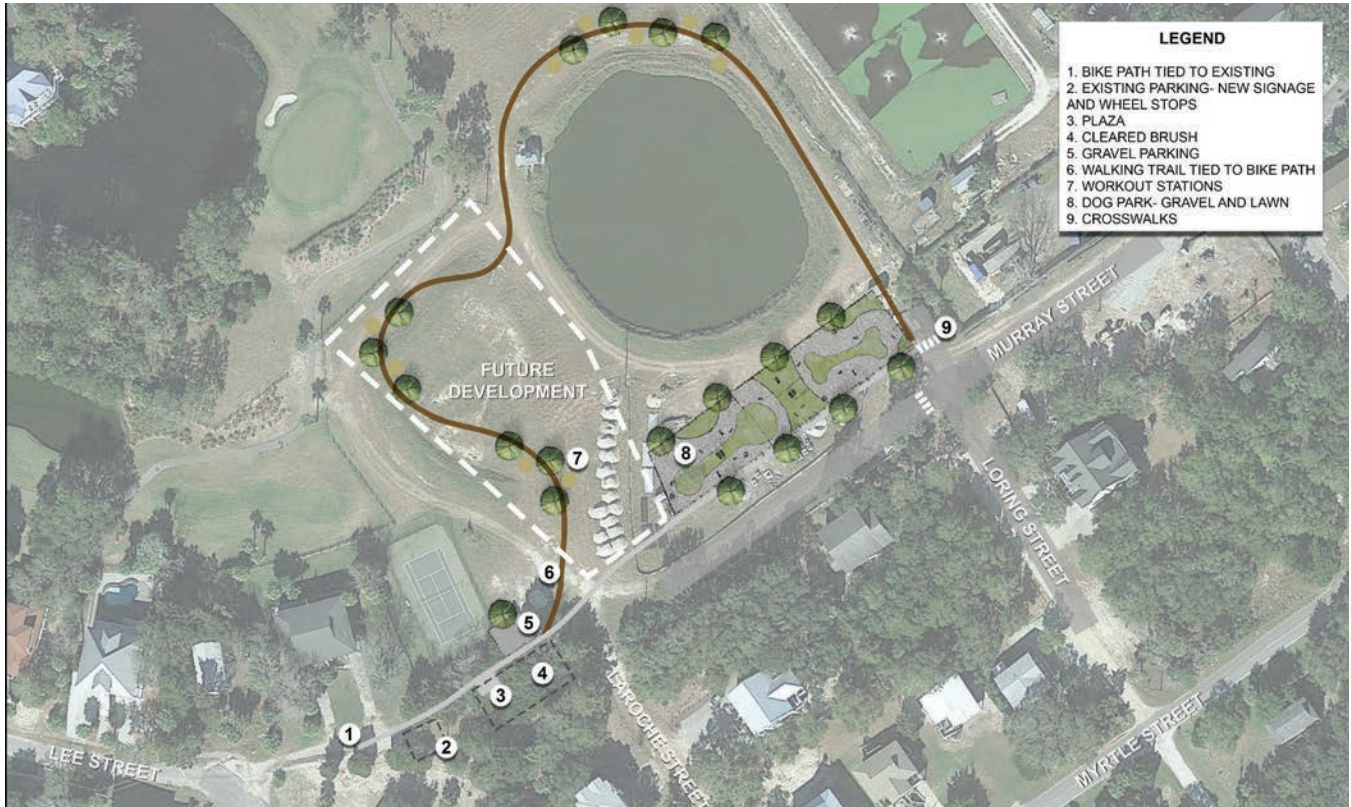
JUNGLE ROAD PARK CONCEPT B
